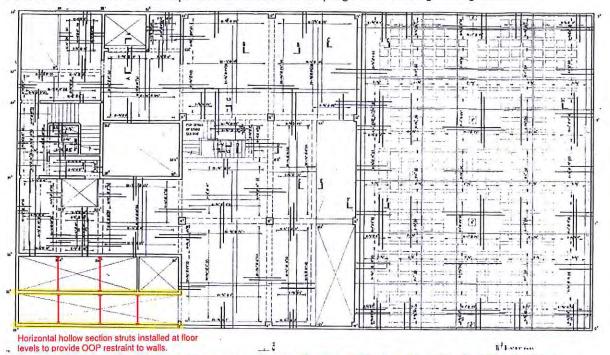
Typical floor plan showing proposed strengthening to upgrade out-of-plane deficiency to walls as highlighted
